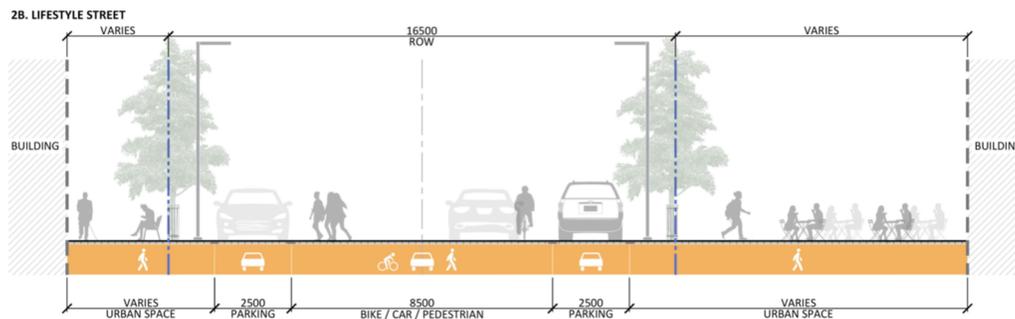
East-west (Lifestyle Street) Private Street Cross-Section
